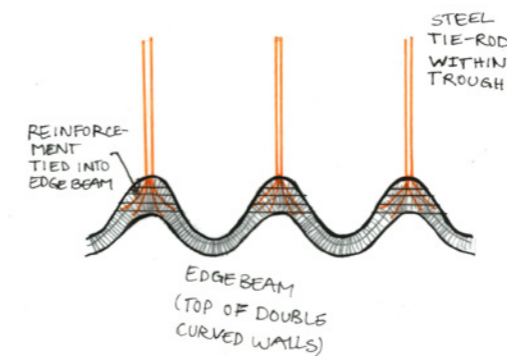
Detail of edge beam connection at the top of the sinusoidal walls
